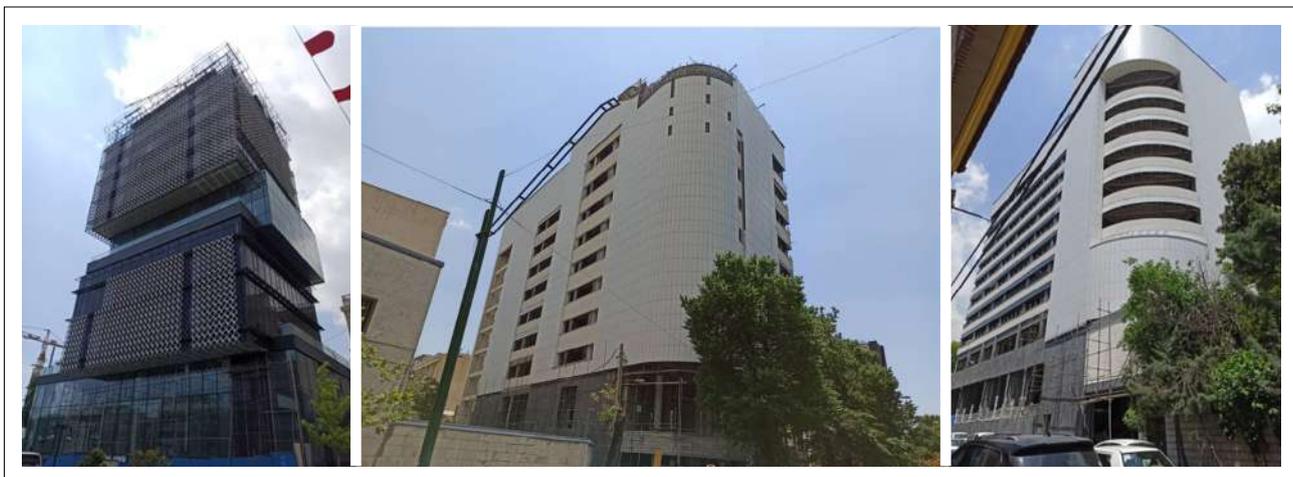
Today's facade of buildings under construction, Tehran, Iran.
